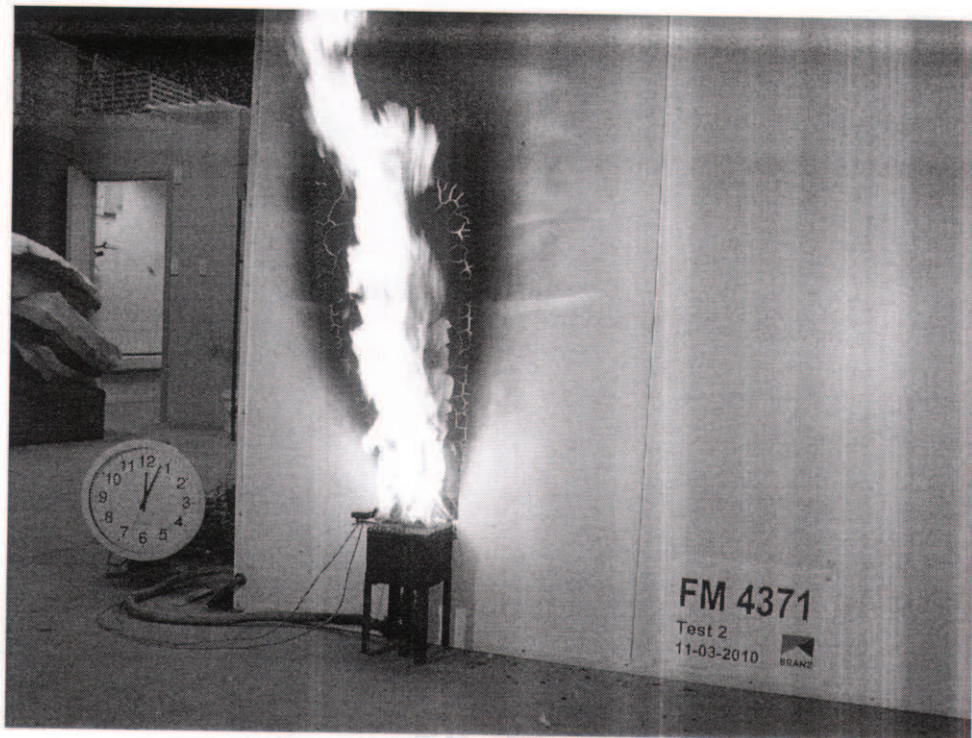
Wall test 2 – after 4 minutes (burner at 100 kW)
